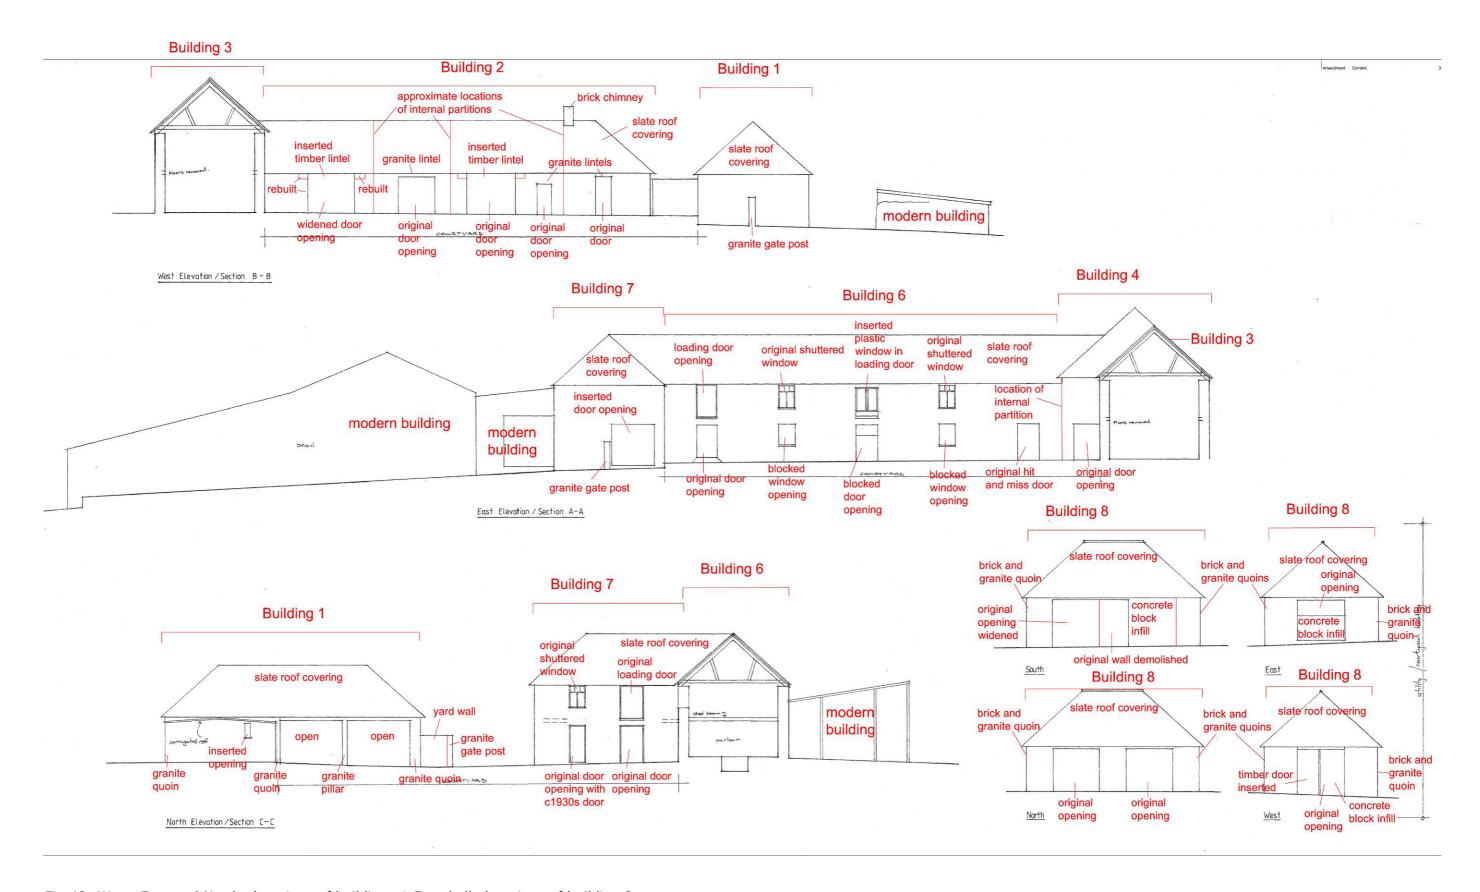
West, East and North elevations of buildings 1-7 and all elevations of building 8
